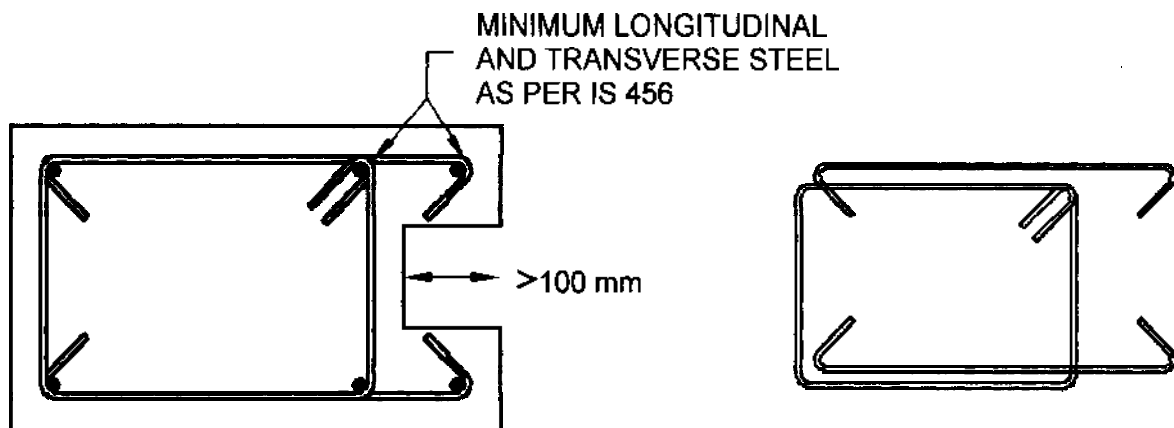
REINFORCEMENT REQUIREMENT IN COLUMNS WITH PROJECTION MORE THAN 100 MM BEYOND CORE
